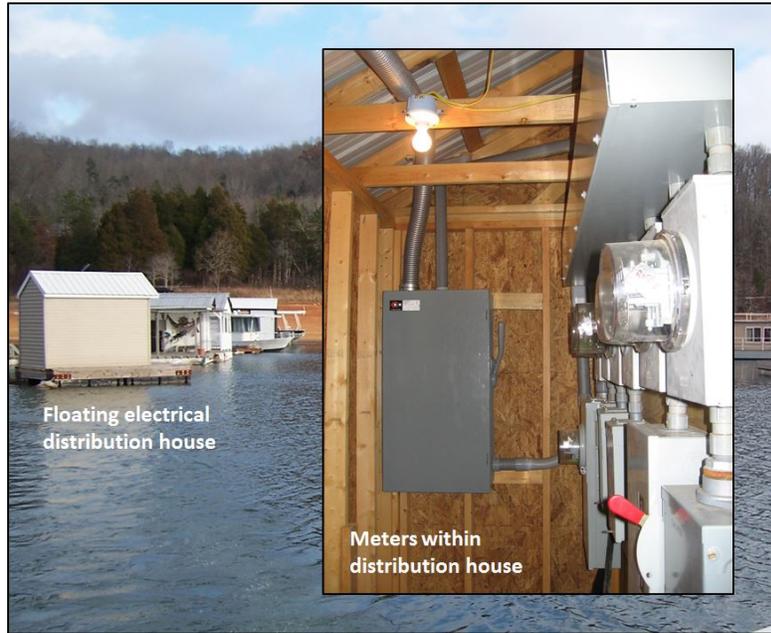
Floating electrical distribution house for multiple floating houses
